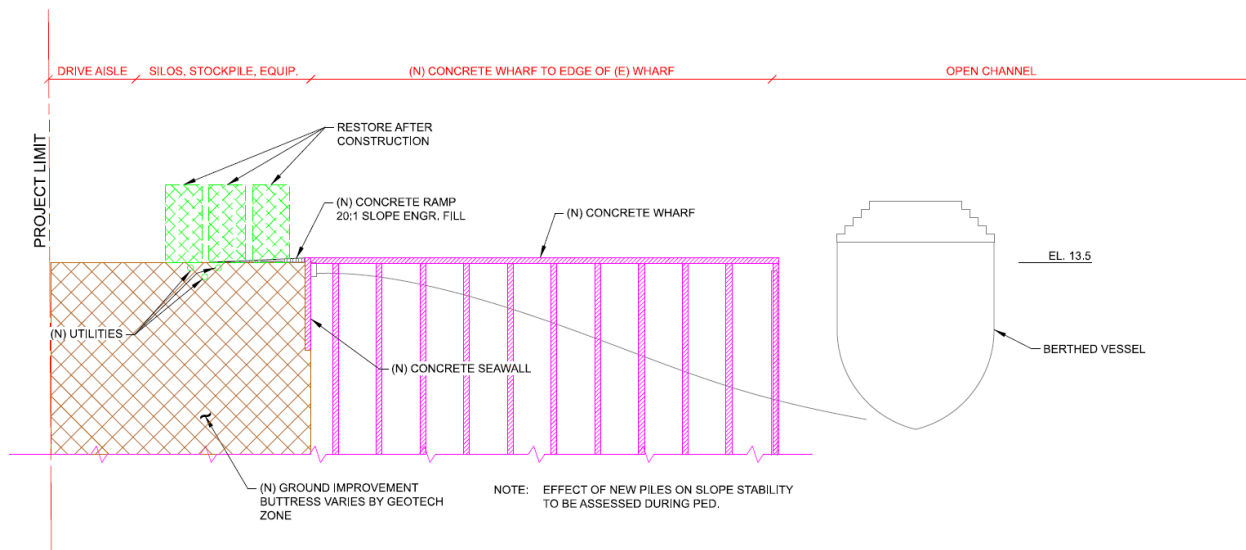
Section 14 Recommended Plan (Reach 4, Islais Creek South)
